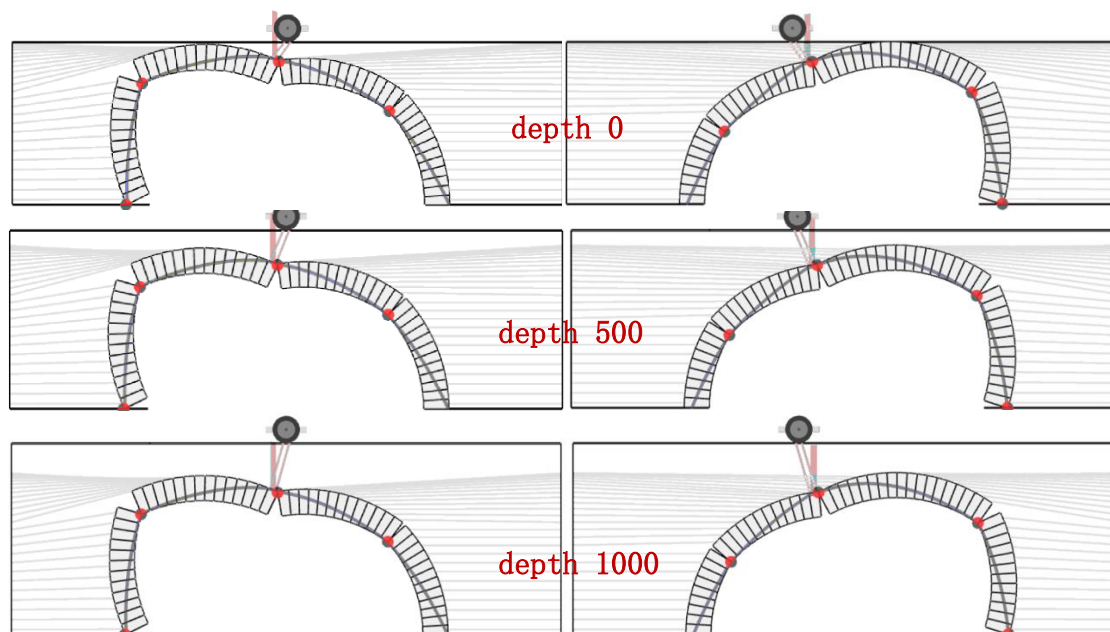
Failure modes for arches with different backfill depth
